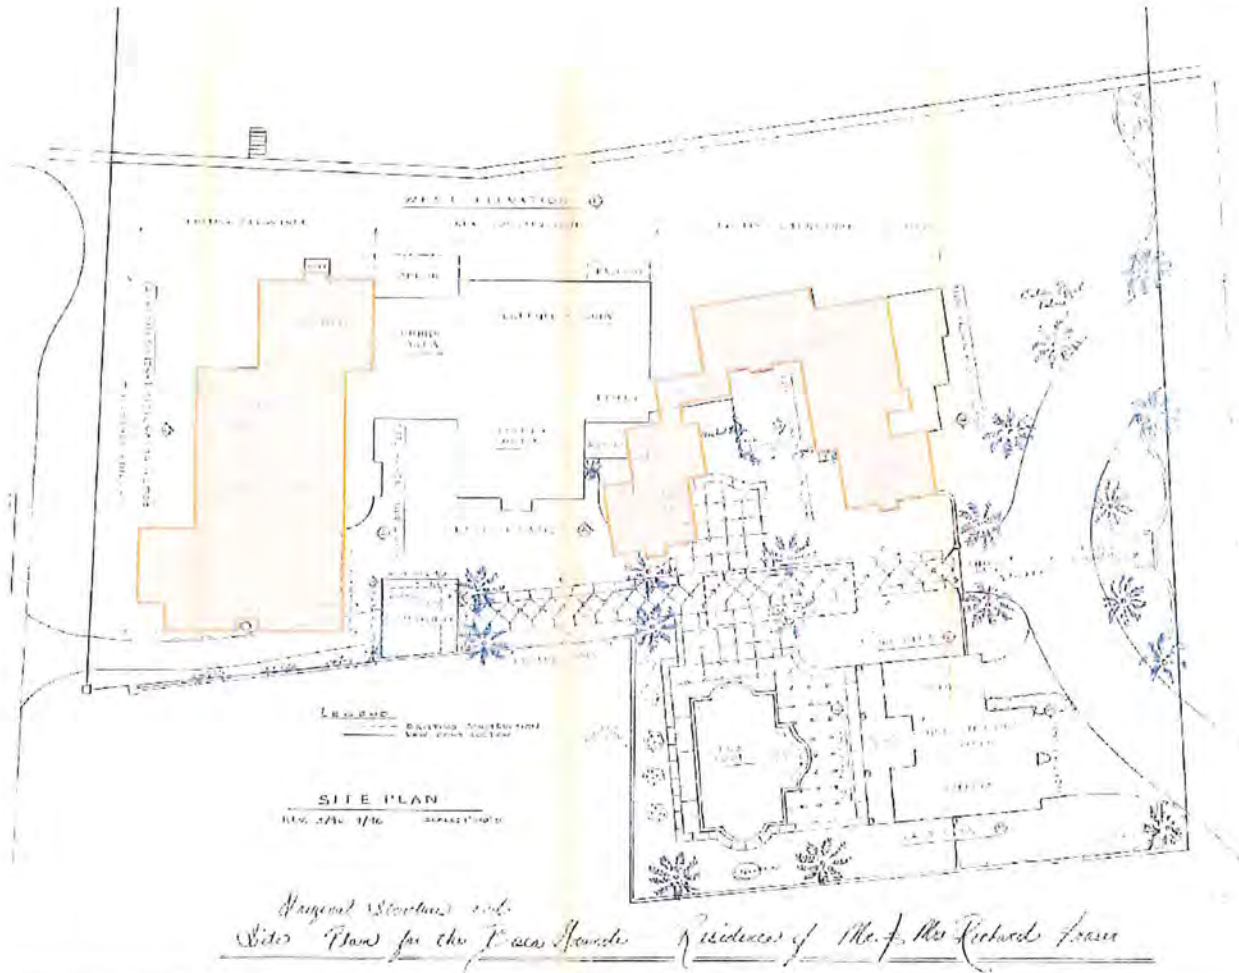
SCA96-11-02 Site Plan with 2 Single Family Structures Highlighted.
